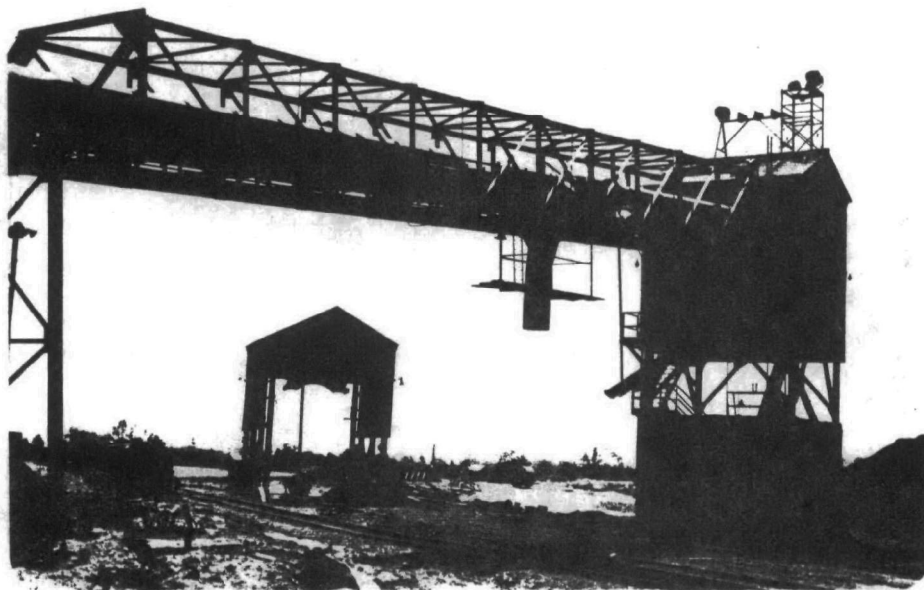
View from ground level facing south showing coal handling facilities. A portion of the coal storage area is also shown.
